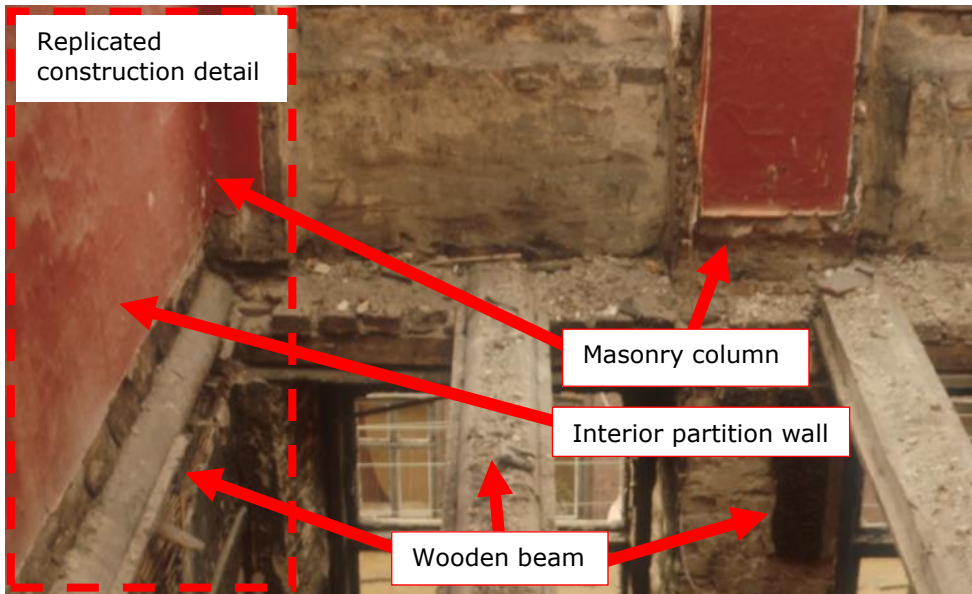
Replicated construction detail in experimental setup. Original photo courtesy of J. Engelmark.
